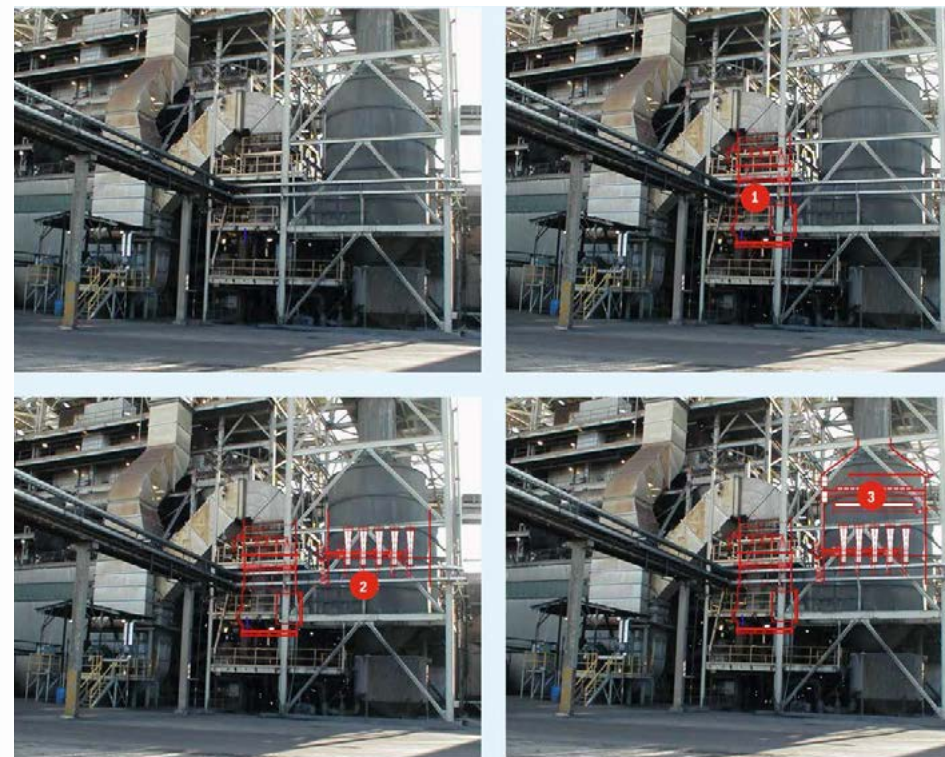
Retrofit plan showing (upper left) original scrubber, (upper right) new quench section, (lower left) new MMV section, and (lower right) new mist eliminator section.
